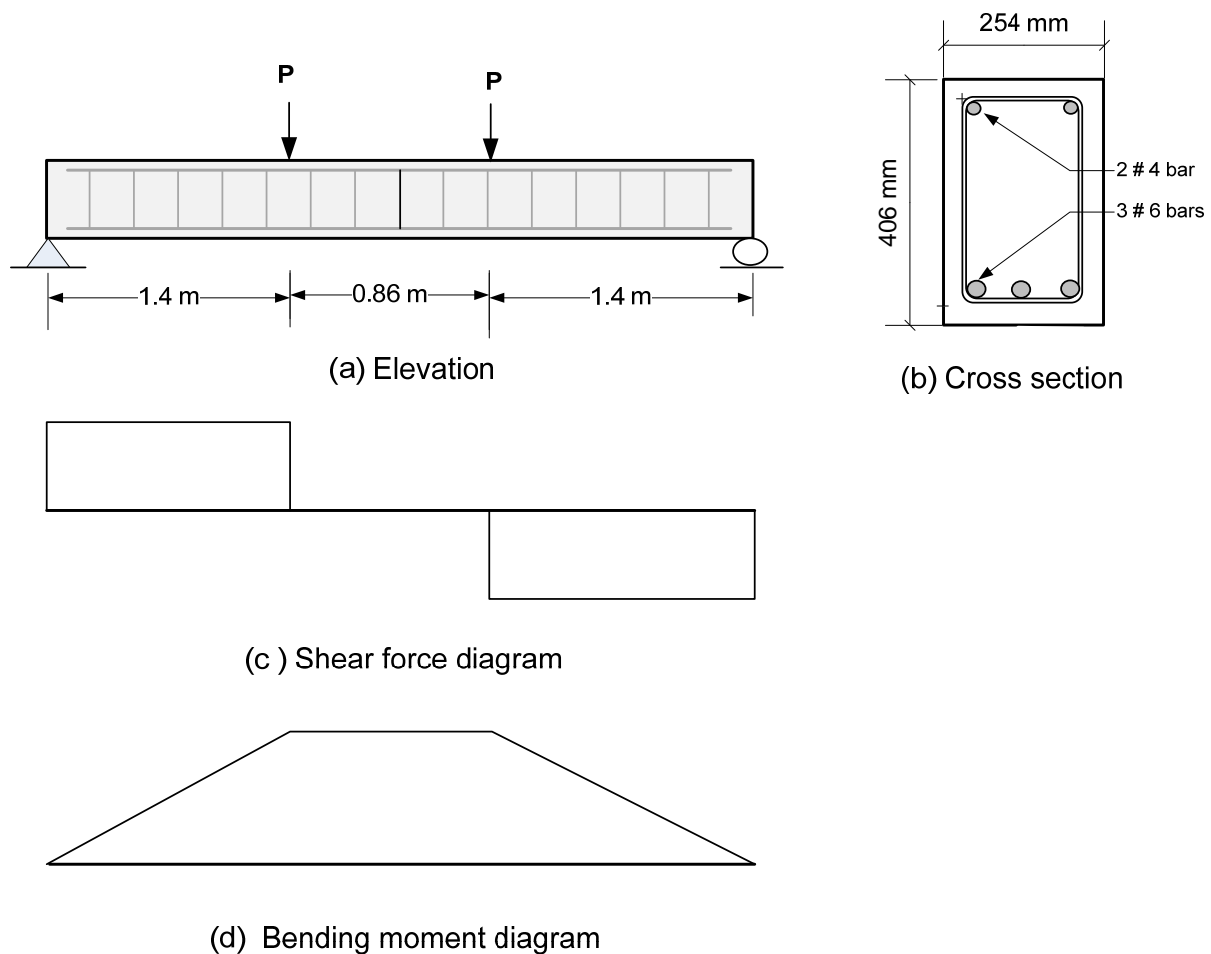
Cross-section, Elevation, Shear Force Diagram, and Bending Moment Diagram for Tested Beams
